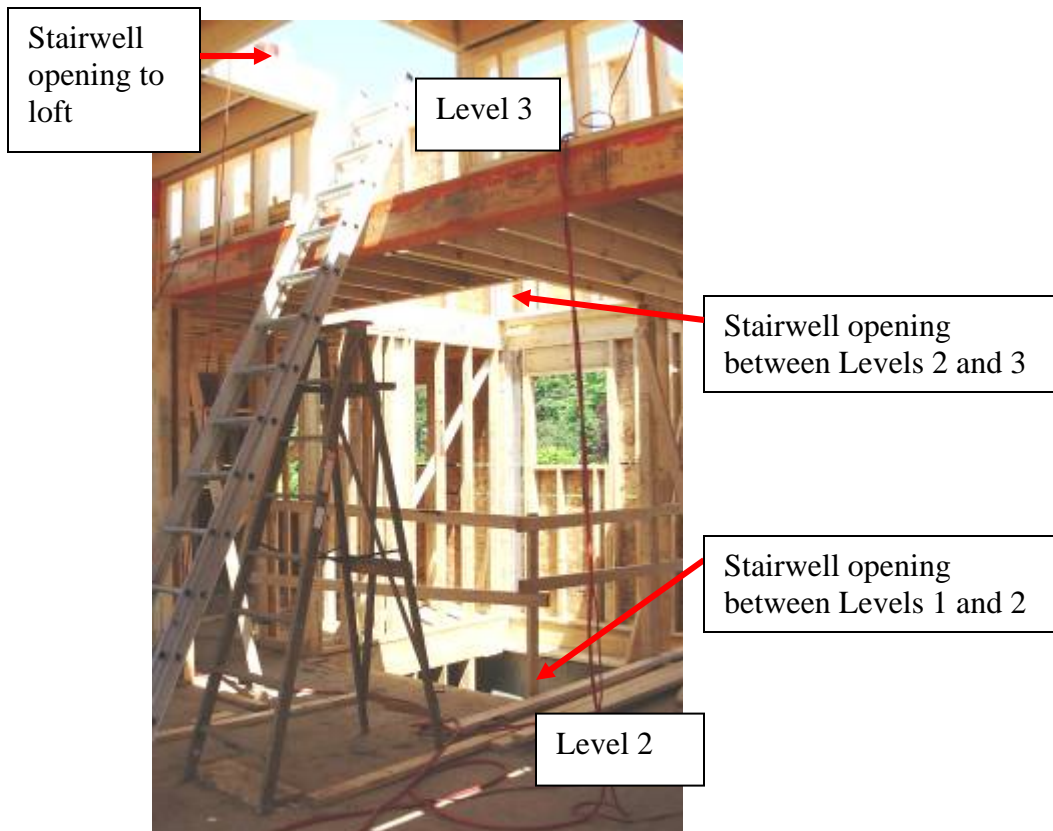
The vertically aligned stairwell openings going from Levels 1 to Level 3. The stepladder was used for access and egress between Levels 2 and 3. The guardrails and extension ladder were put in place after the incident.
